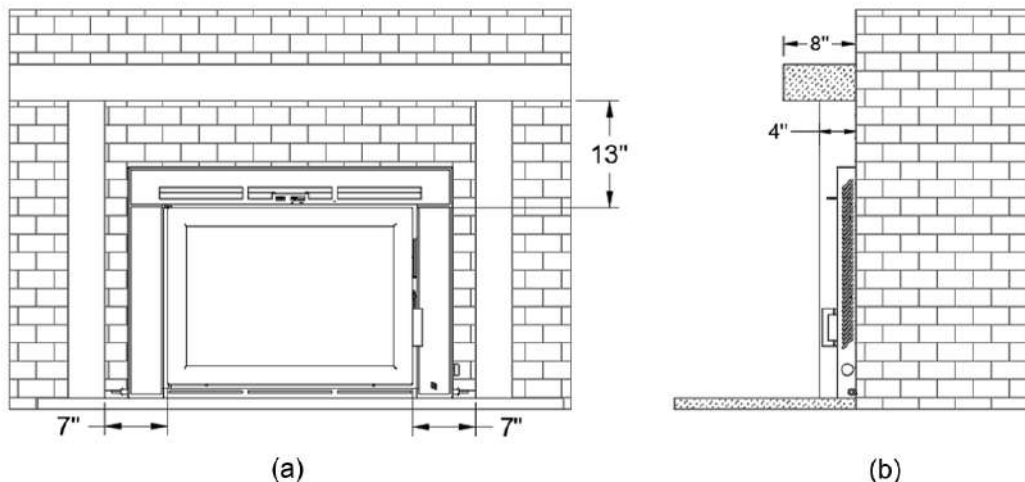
Clearances to Combustibles (a) Front View (b) Side View
